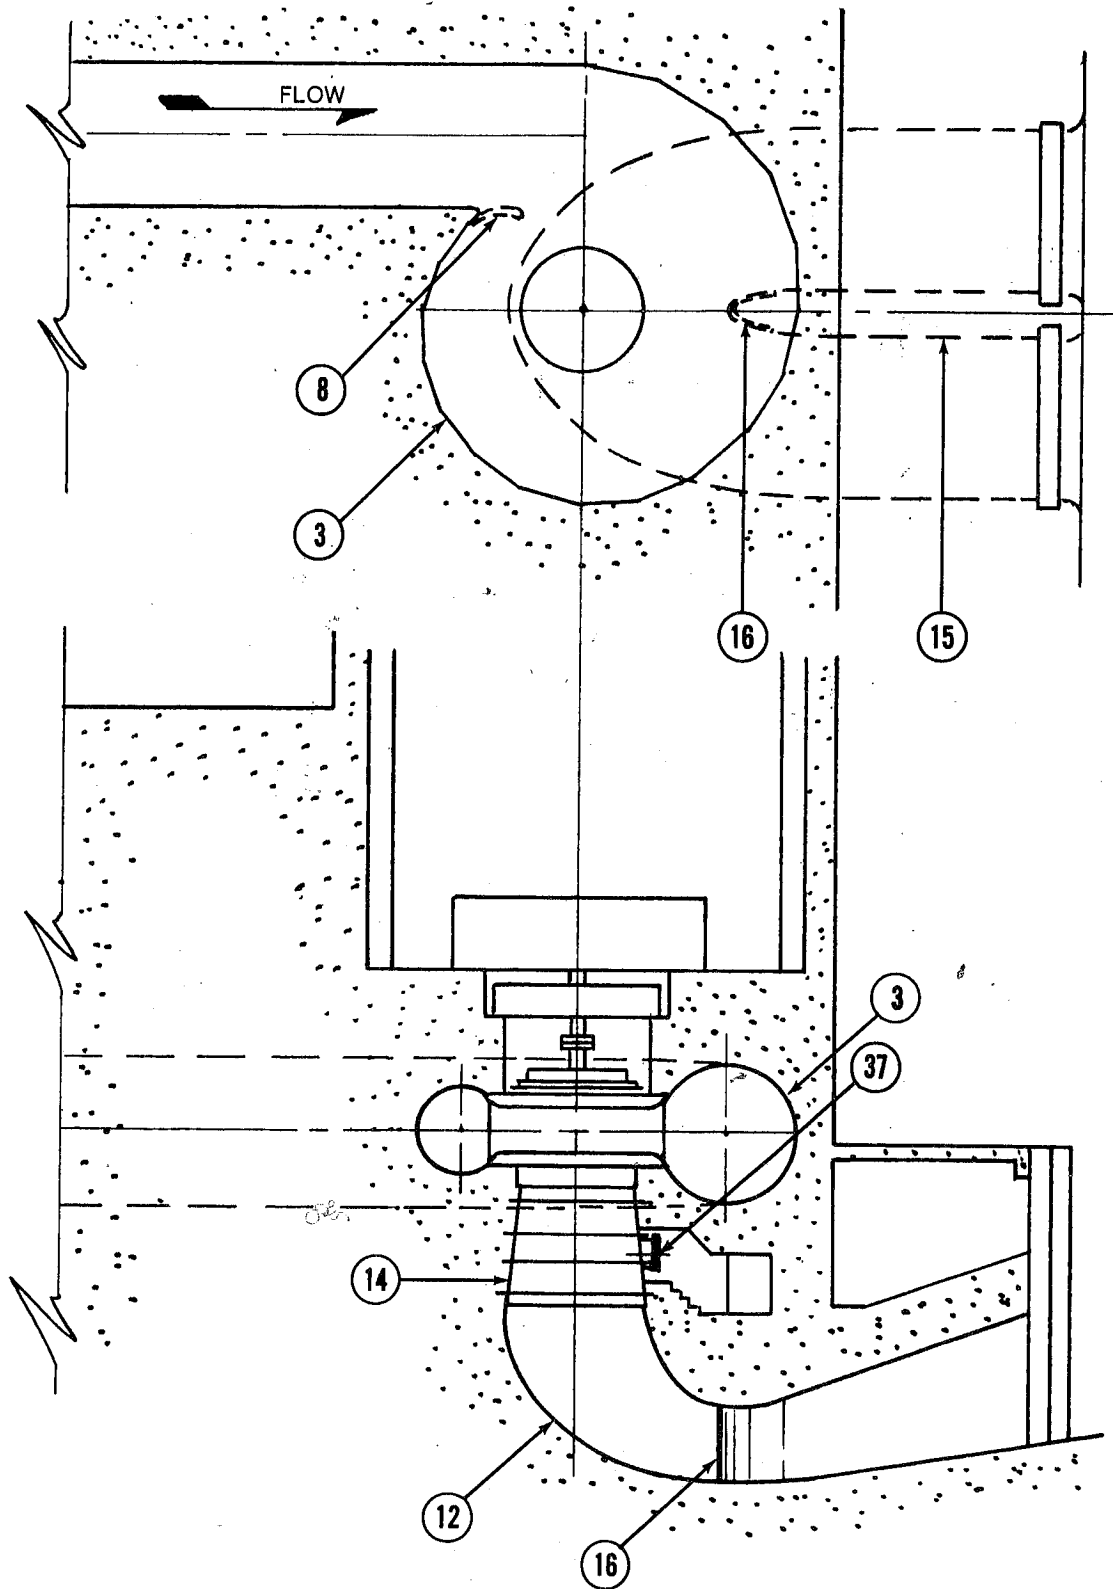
Plate Steel Spiral Case and Elbow Draft Tube
